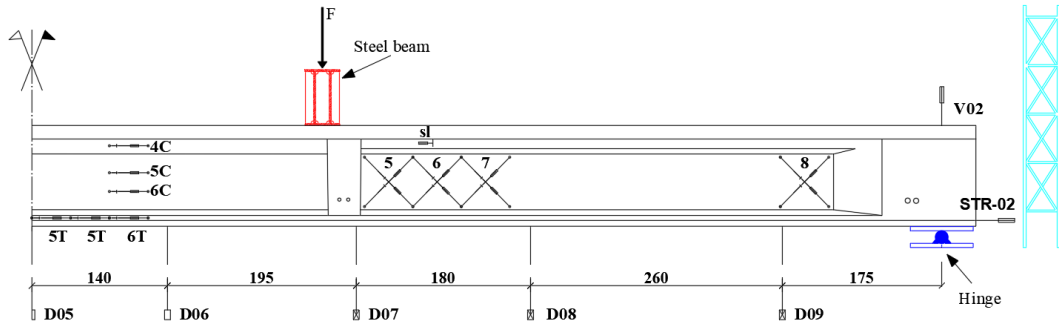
Test setup and layout of the monitoring system installed on B6-P48/P49 girder (unit: cm).
